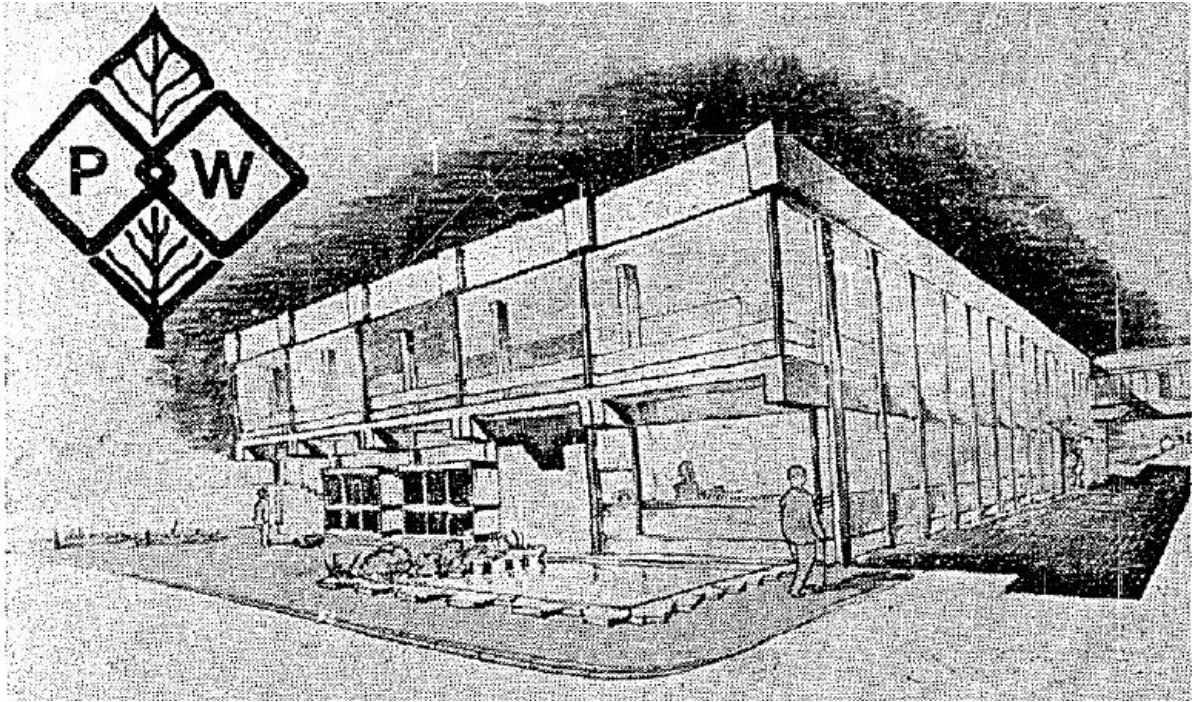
ARCHITECT'S SKETCH OF THE PROPOSED NEW BUILDING, PUBLISHED IN THE IRISH INDEPENDENT, MARCH 30TH 1967.
